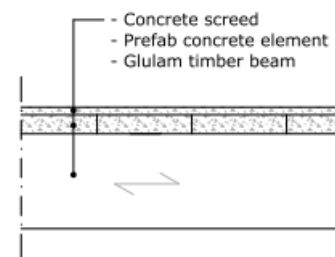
Lay-up floor system Park&Ride Antwerp
